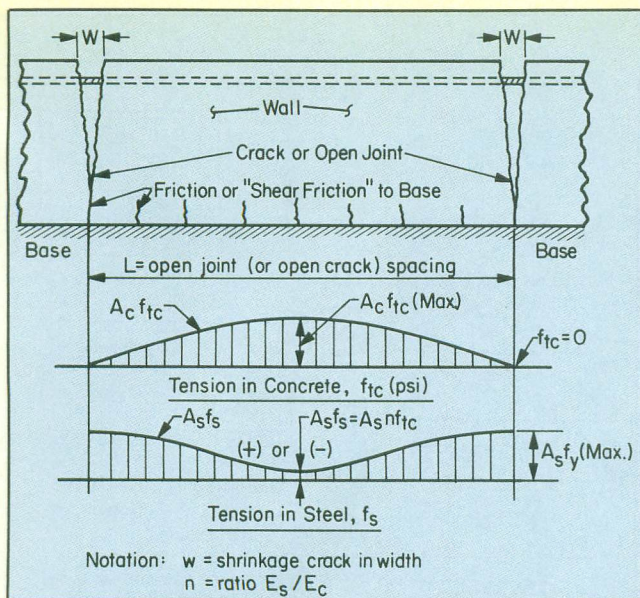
Simplified mechanism for shrinkage crack- ing.
